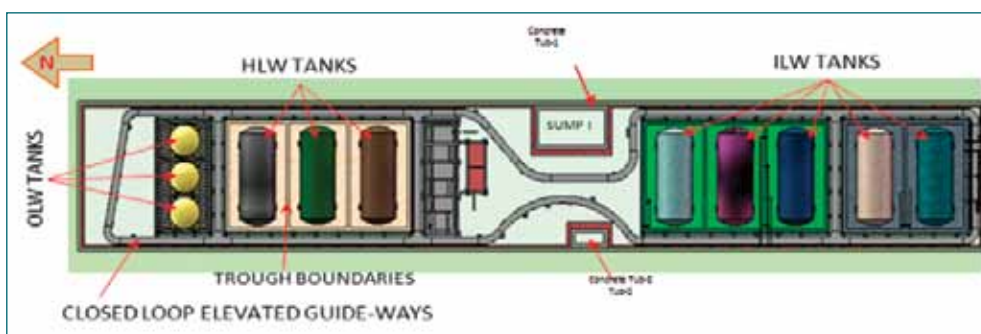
Plan view of DFRP waste-vault layout showing the track
